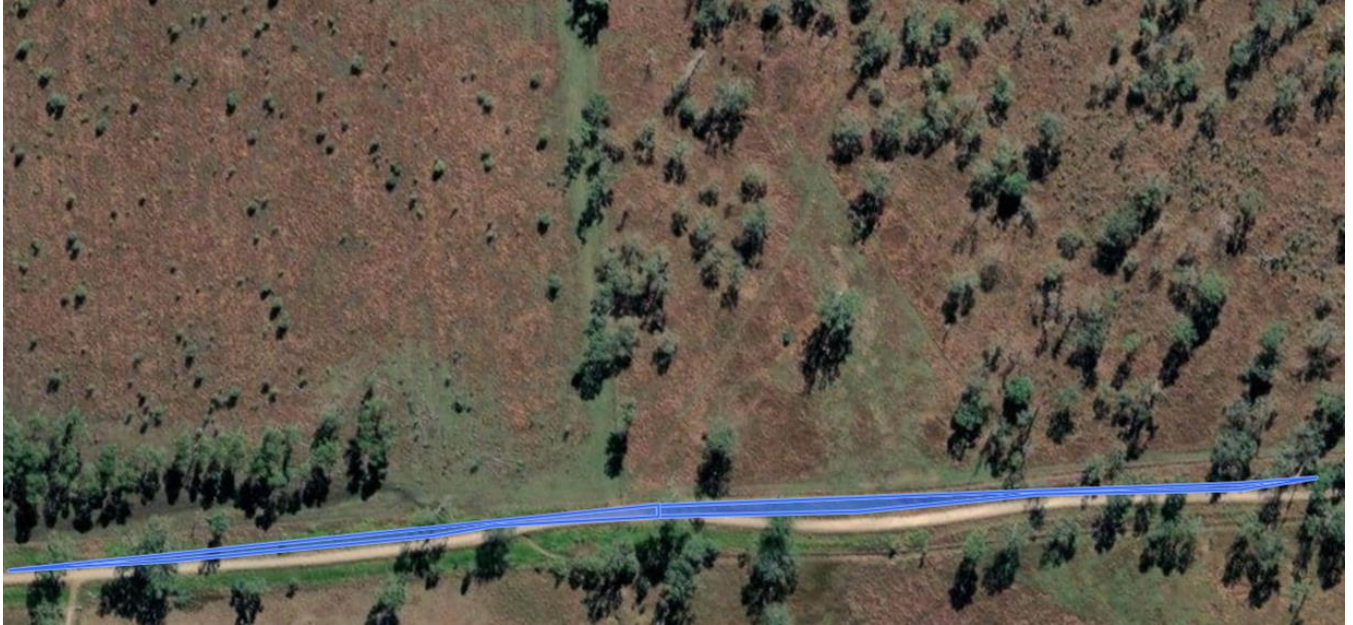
Burgess Road / Site Access Sight Distance Triangles (Source: Nearmap, PSA)
